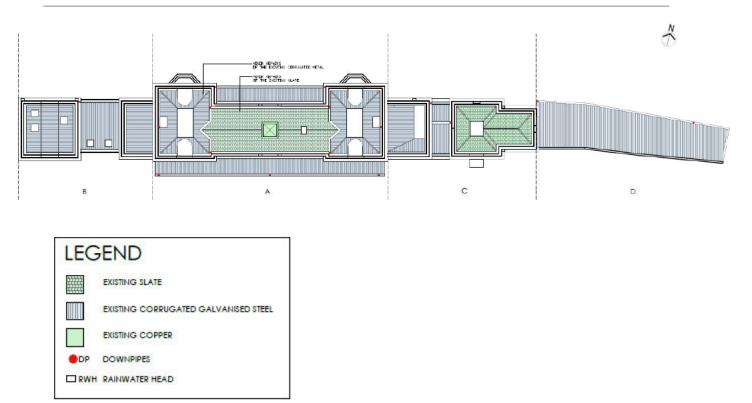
Existing roof plan of Former Station Building, showing roof sheeting types, location of downpipes and rainwater head (OCP Architects, 2023)
